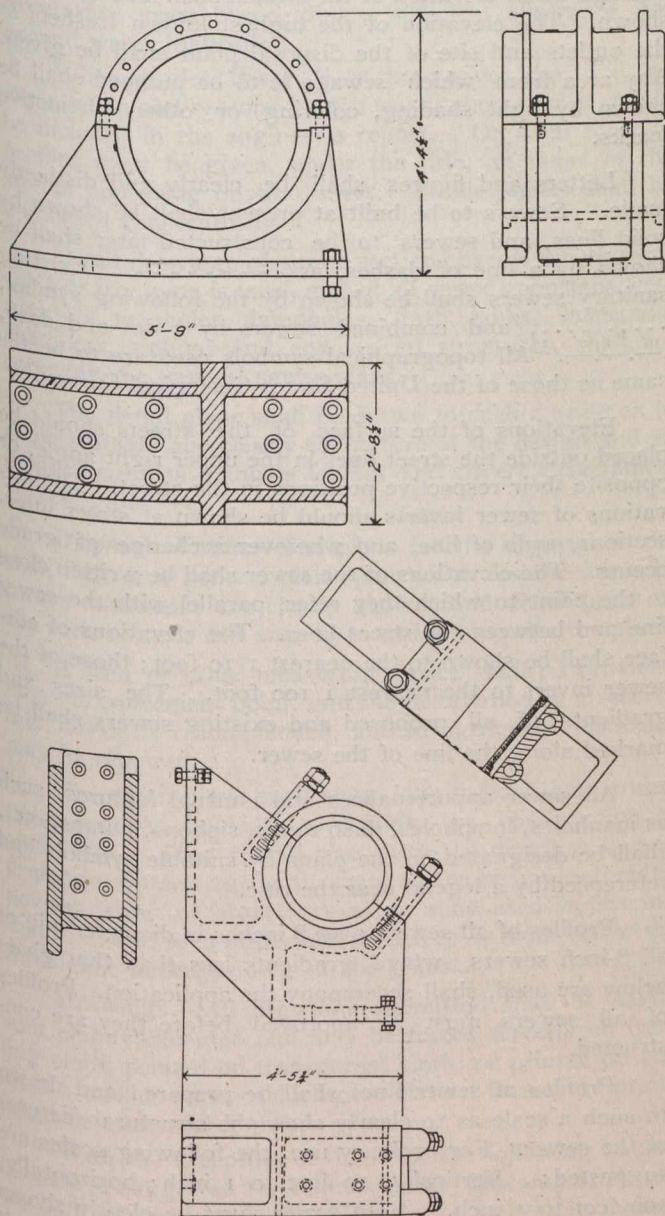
Kaministiquia River Bridge—Details of Trunnion Bearings.
